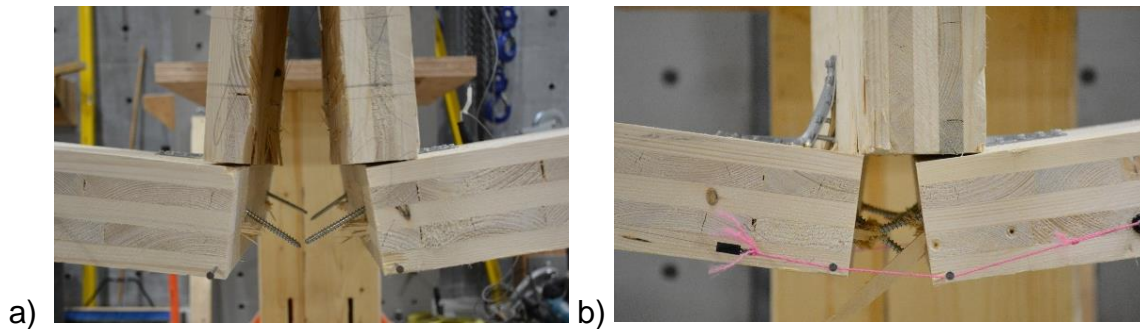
16 Failure with wall splitting (a, S3-B-P-A-15), failure without wall splitting (b, S4-B-P-A-F)
